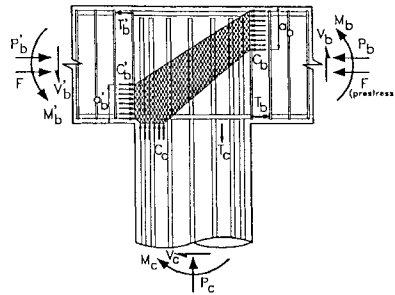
Idealized joint strut for a tee joint with cap beam prestressing.
